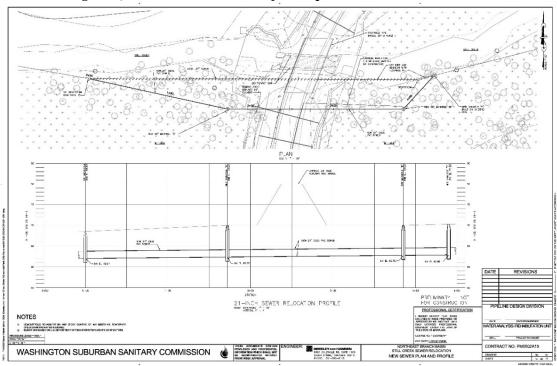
, Alternative 2: Profile and Section for Proposed Sewer line Relocation
